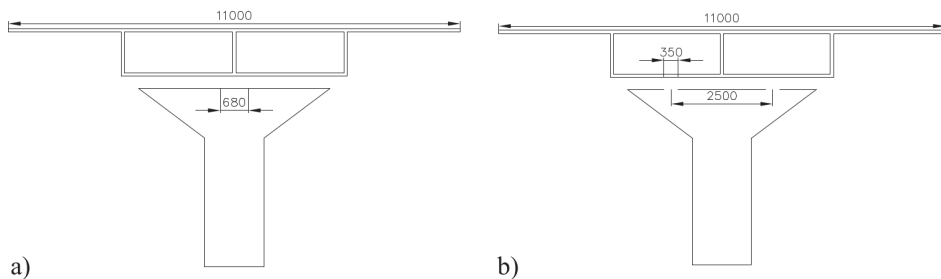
Cross section of accident bridge: a) piers B and C, b) piers A and D (mm)
